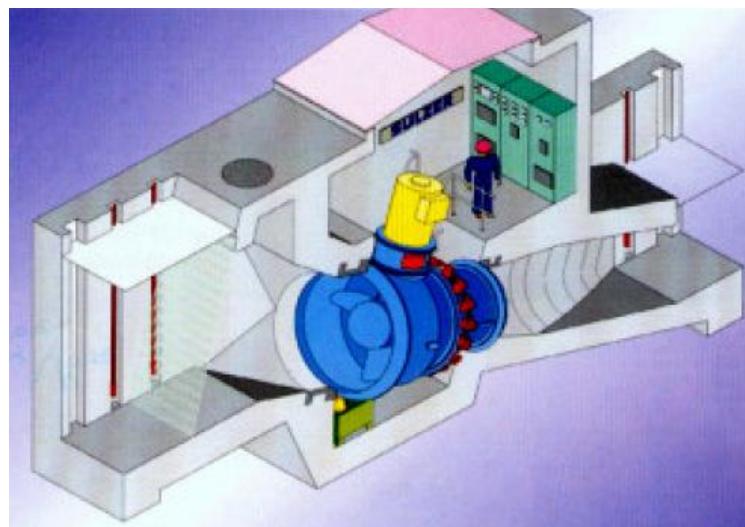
Illustration of inclined axis, very low head Kaplan gear turbine unit.
